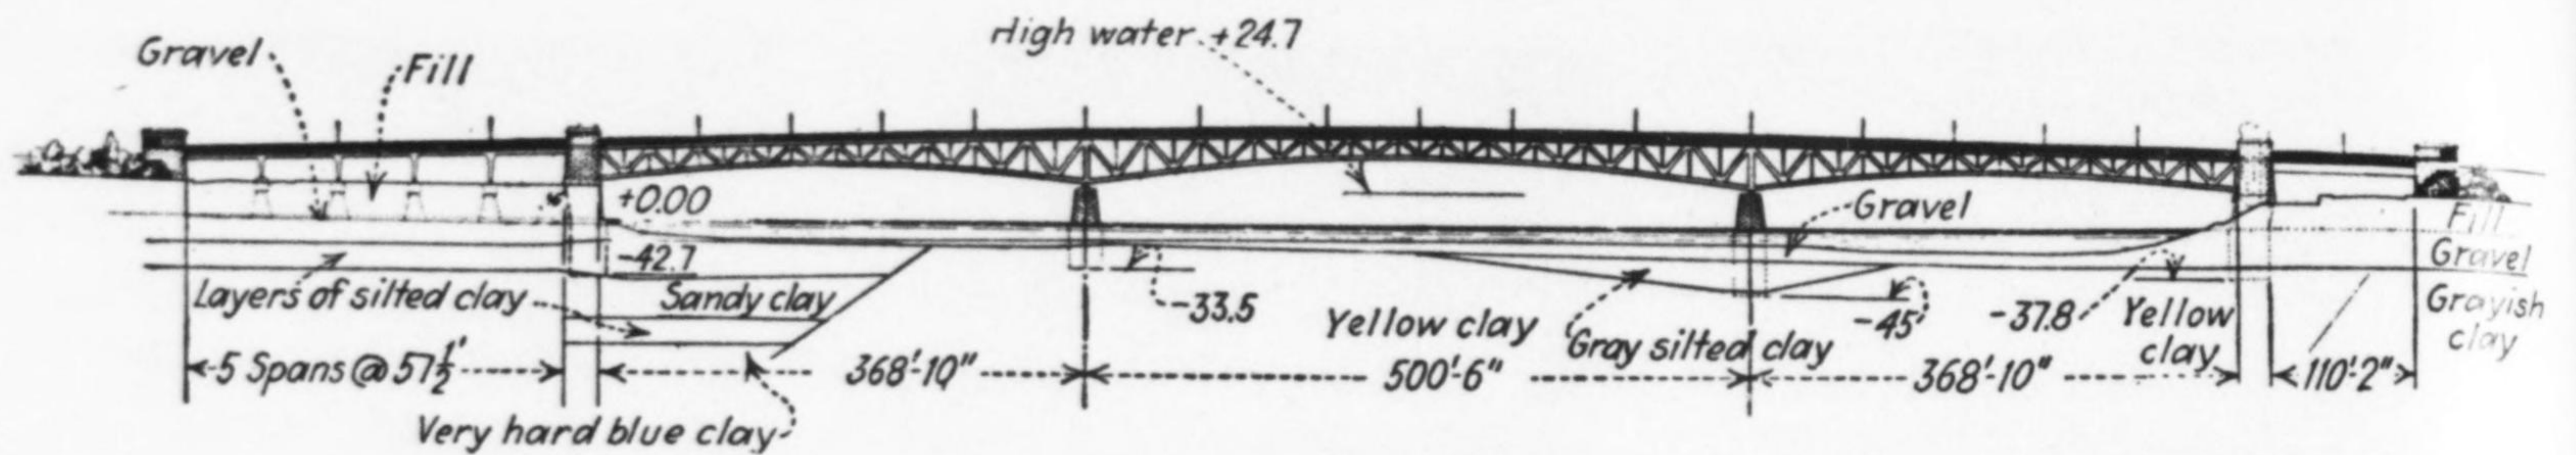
SHALLOW continuous truss bridge under construction over the Danube River in Budapest, Hungary. Rise-span ratio of 500 ft. center span is only 1:38.
